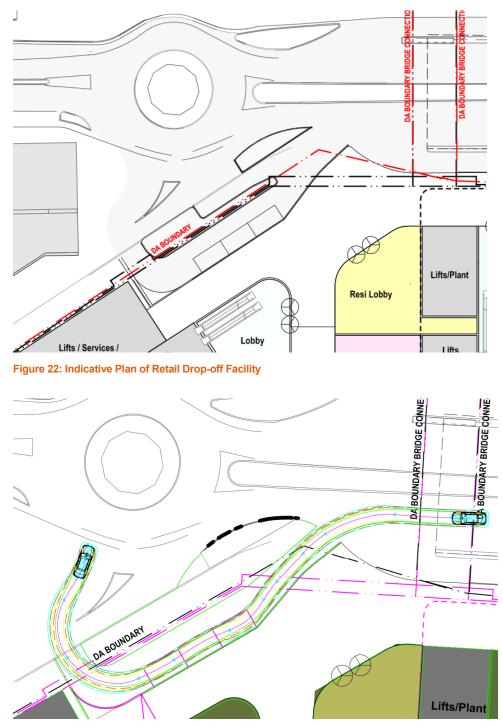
5.2m Car Swept Path at Indicative Plan of Drop-off facility
